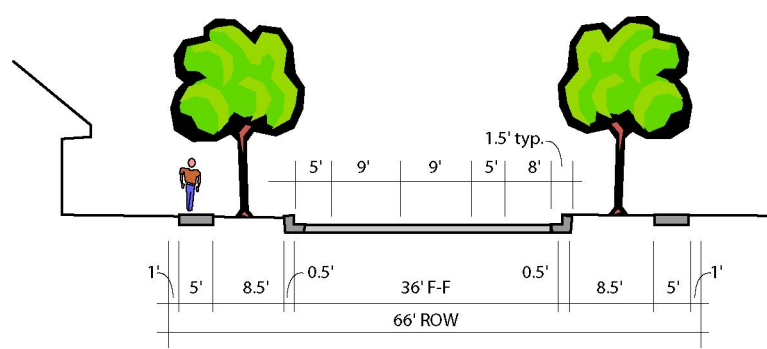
Schematic sketch of a typical collector street cross-section with one-sided parking and bike lanes.
